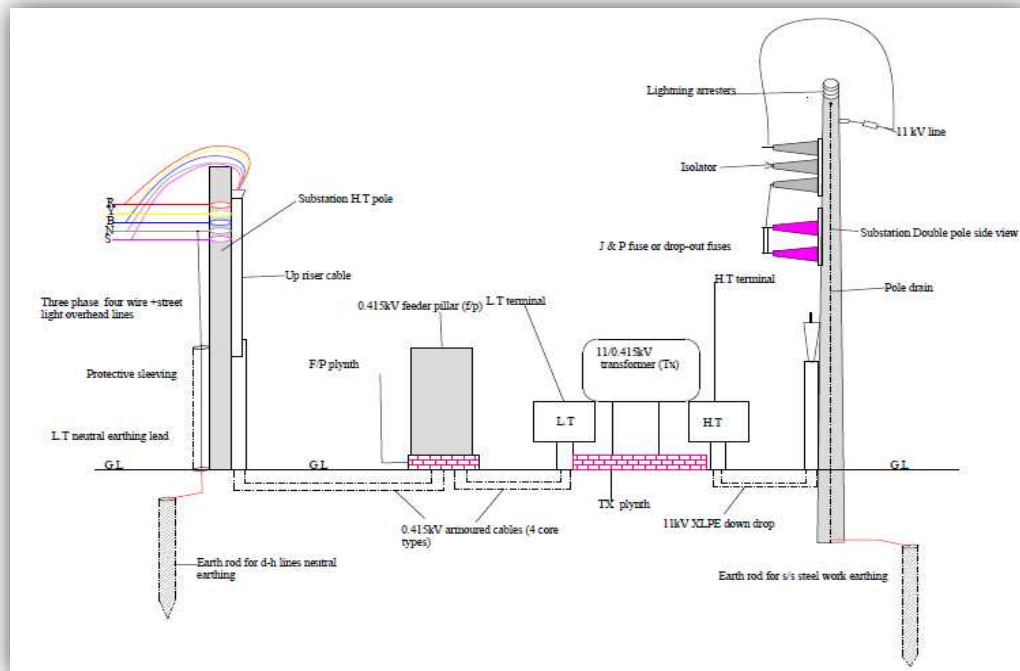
Distribution Substation arrangement with H.T down drop and L.T up riser cable
